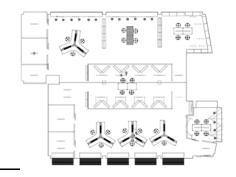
Open Office – Workstation Work Plane Illuminance (fc) – Electric Light
